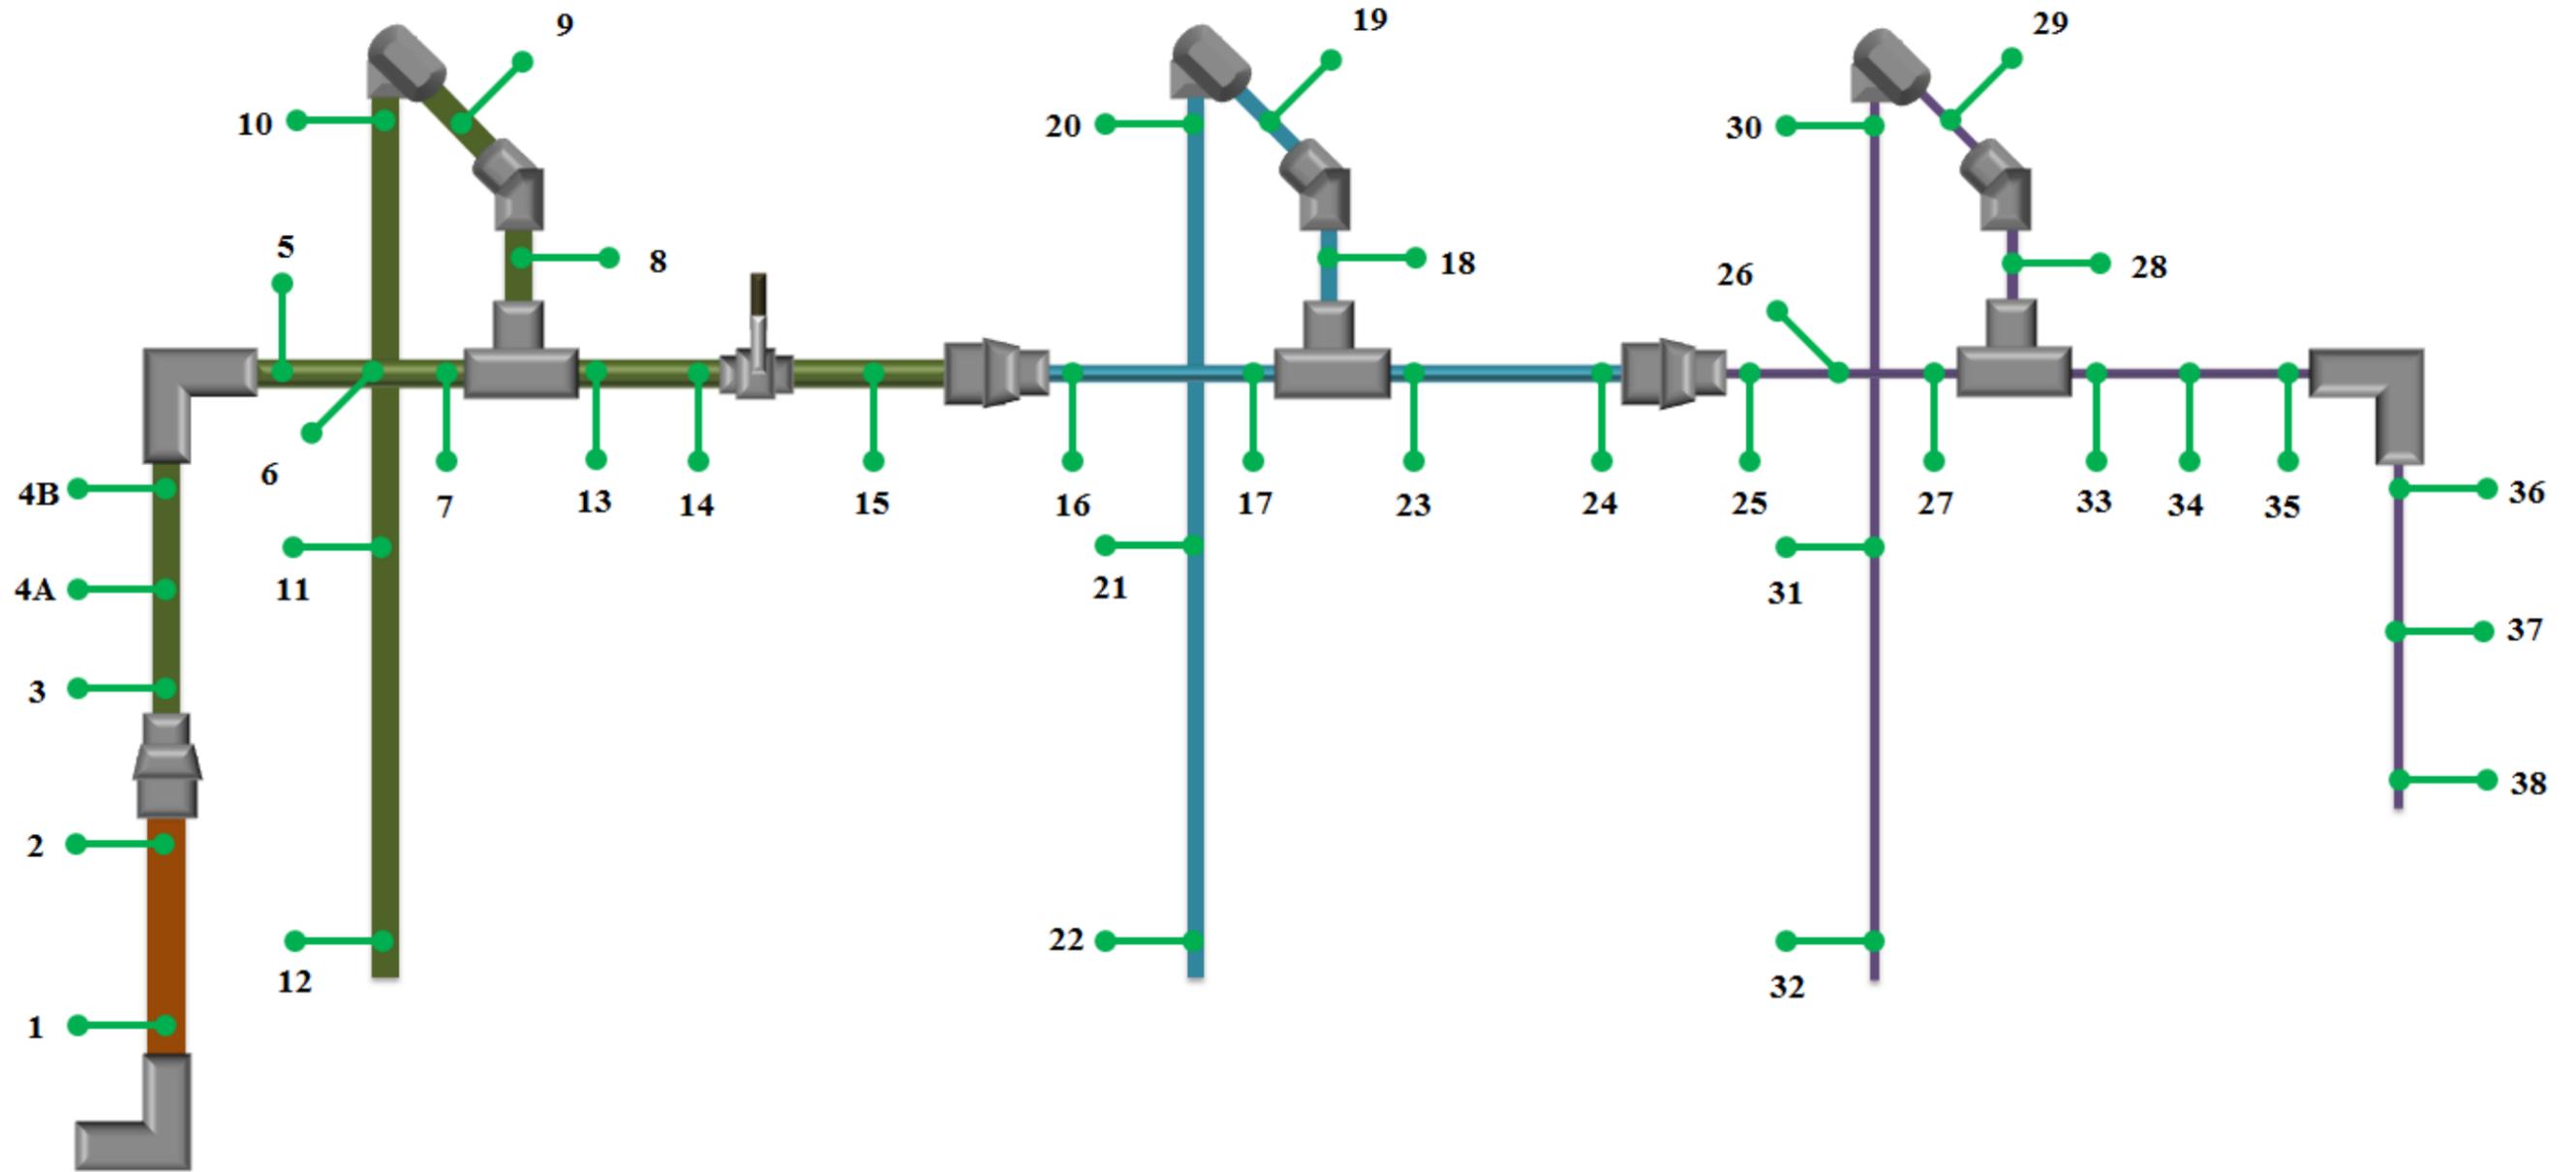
Pipe Diagram Illustrating Cross-Section Cut Locations.
